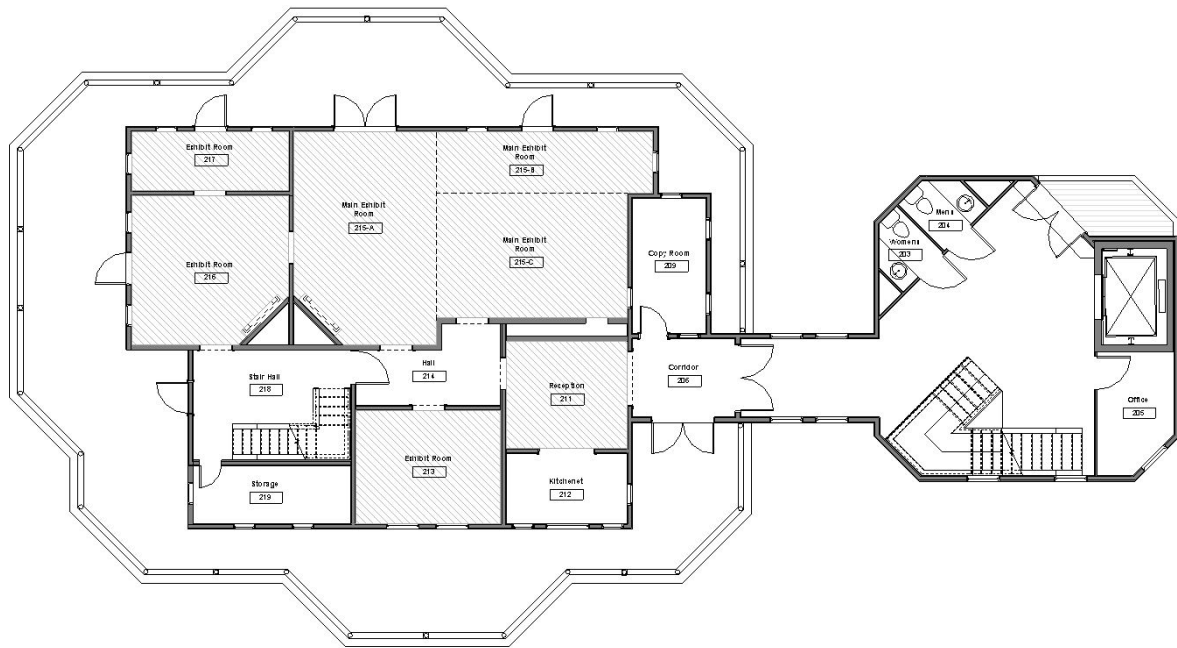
Floor plan of the second floor of Lucas Mansion showing the rooms in which recommended treatment approach is confined with diagonal hatch (gallery rooms).
